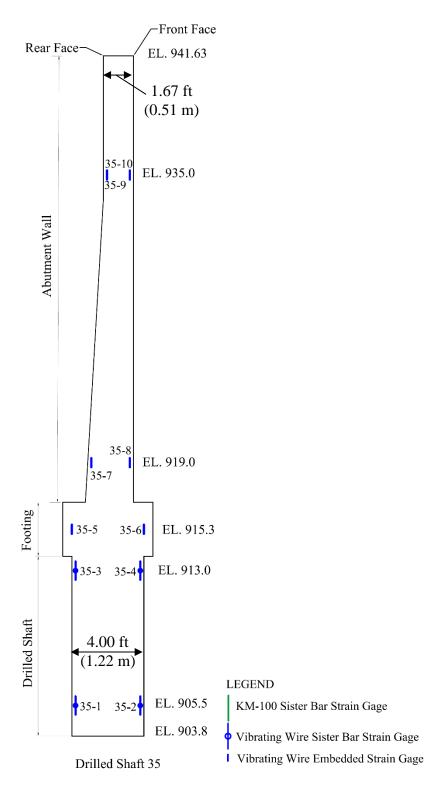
Gage locations in Drilled Shaft 35, footing, and abutment wall (EL in ft: 1 ft = 0.305 m).
